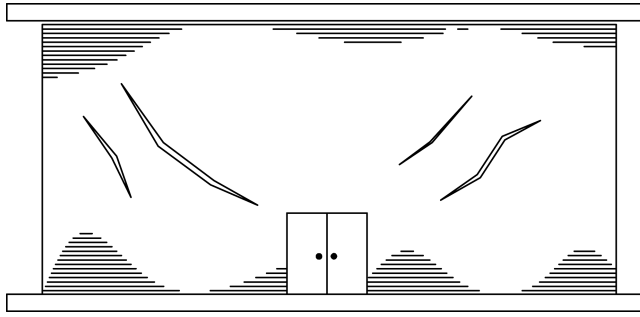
Sketch showing wall cracks not caused by foundation settlement.
